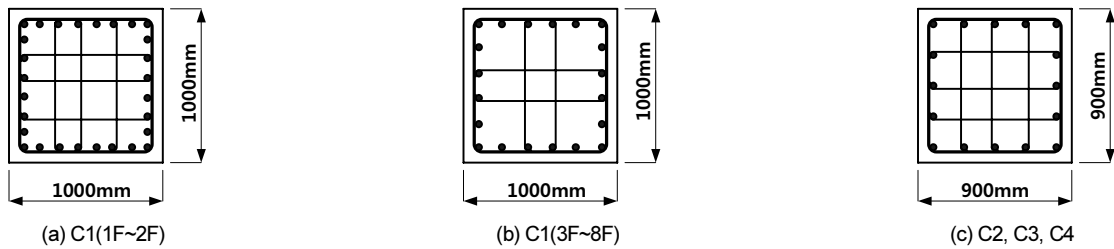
Dimension and reinforcement arrangement of column cross sections
